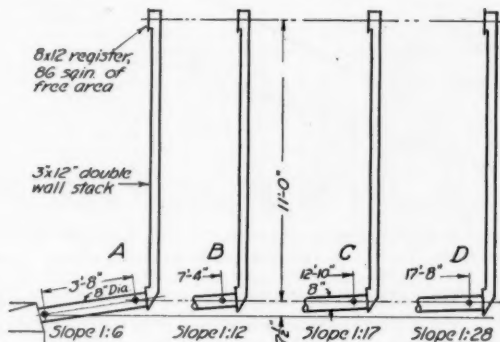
DETAILS OF SECOND STORY PIPES TESTED
